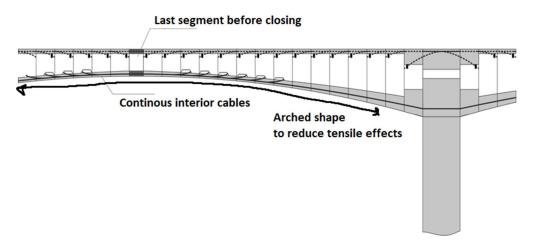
Possible cable layout for segmental construction drawing of Prof Erhan Karaesmen Middle East Technical University, Turkey [31]
